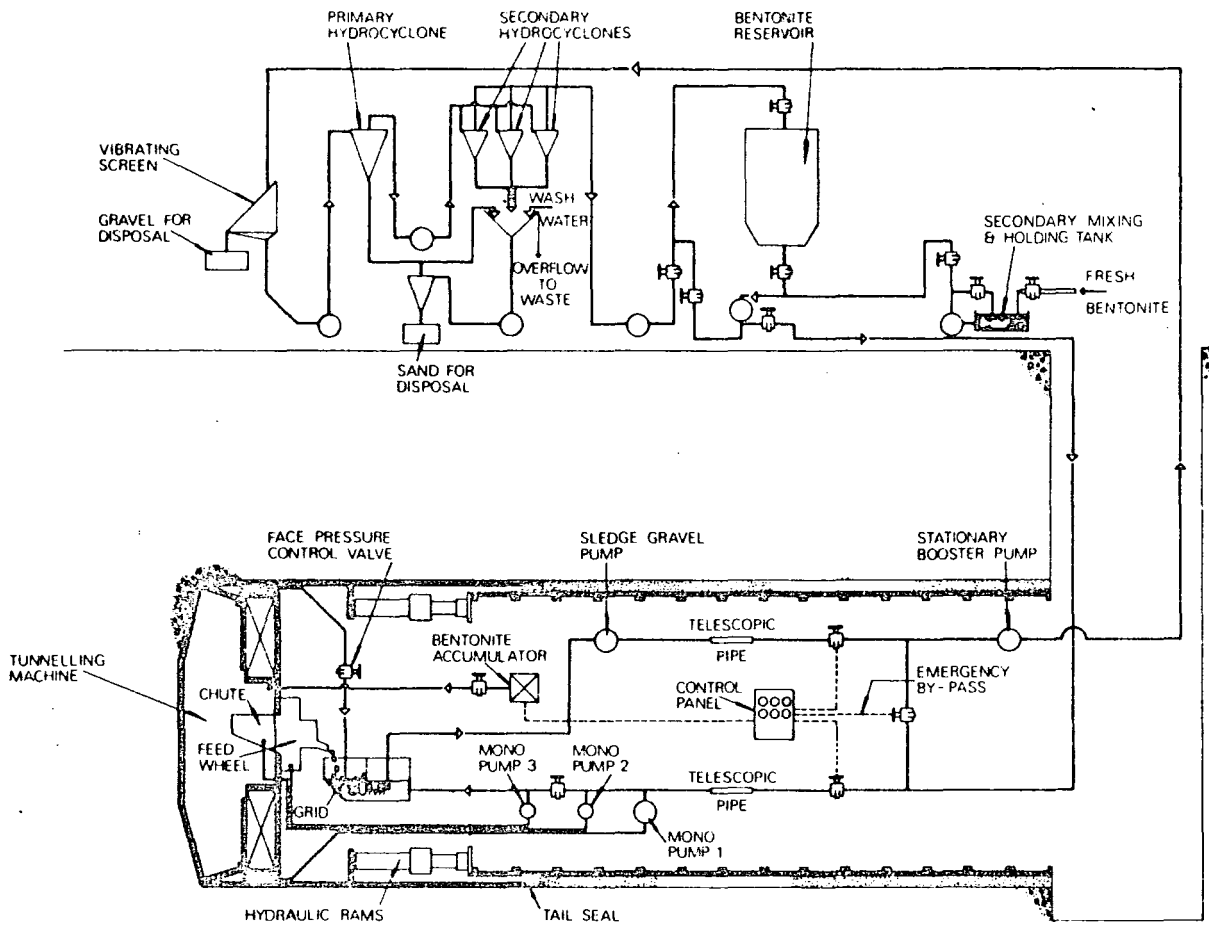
THE BENTONITE TUNNELLING SYSTEM
